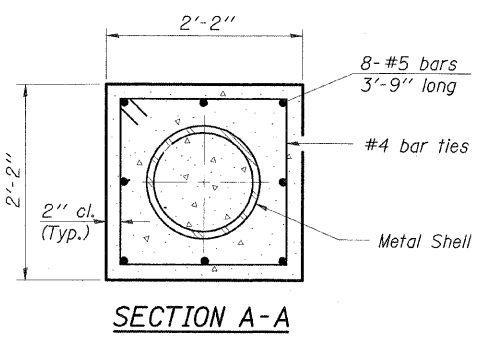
DETAIL OF REINFORCEMENT FOR METAL SHELLS AT ABUTMENTS
